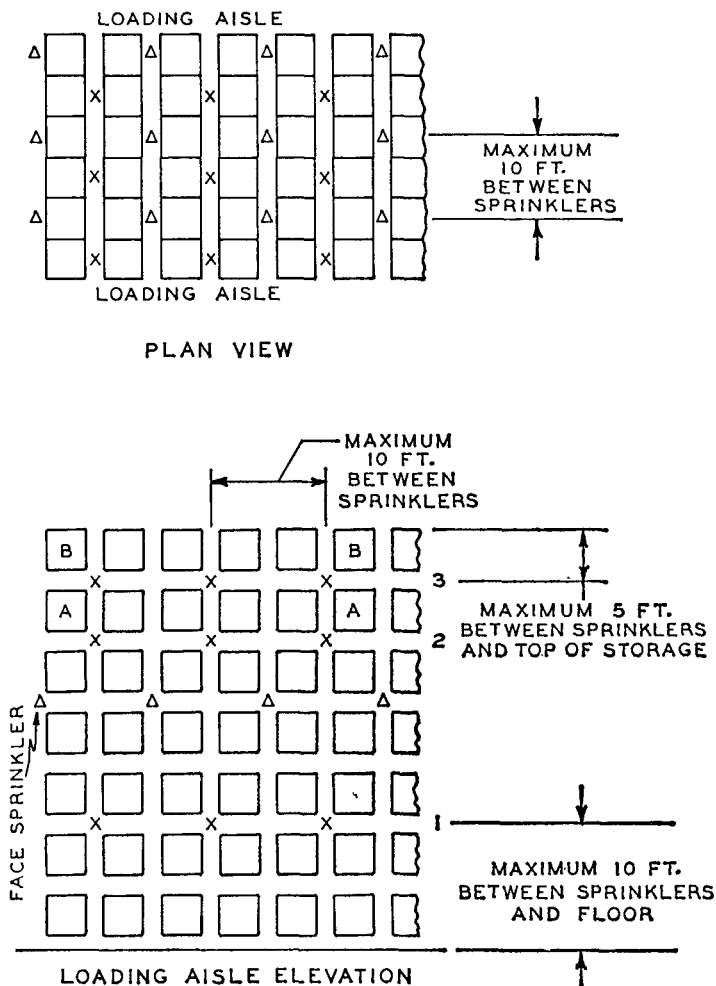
In-Rack Sprinkler Arrangement — Multiple Row Racks. Class II or III Commodity. Height of Storage over 25 Feet.
